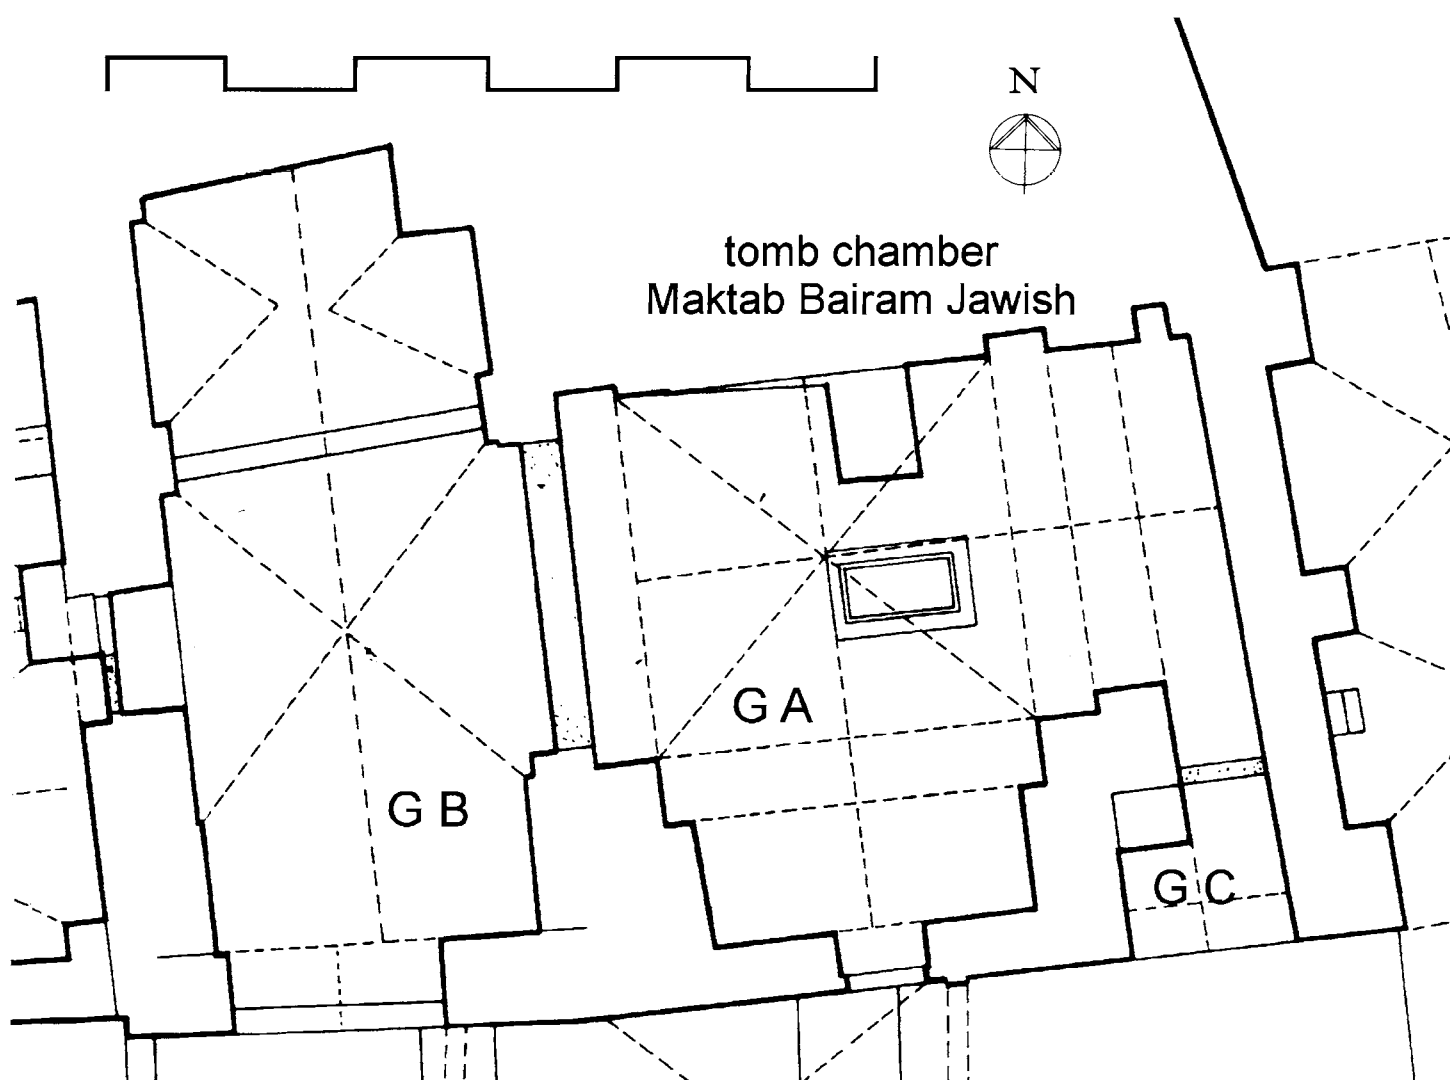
Maktab Bairam Jawish, ground plan.
